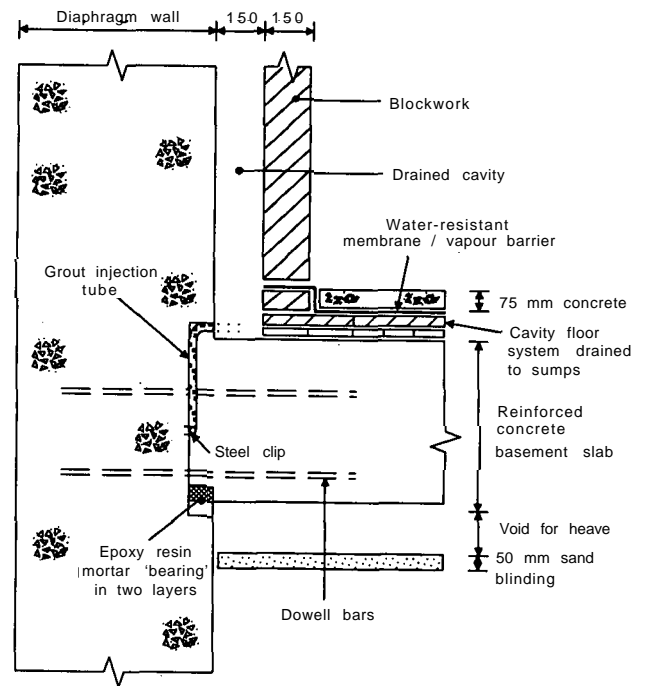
Detail of base slab / diaphragm wall junction. An example of Type C protection indicating special provisions at the wall / floor joint
